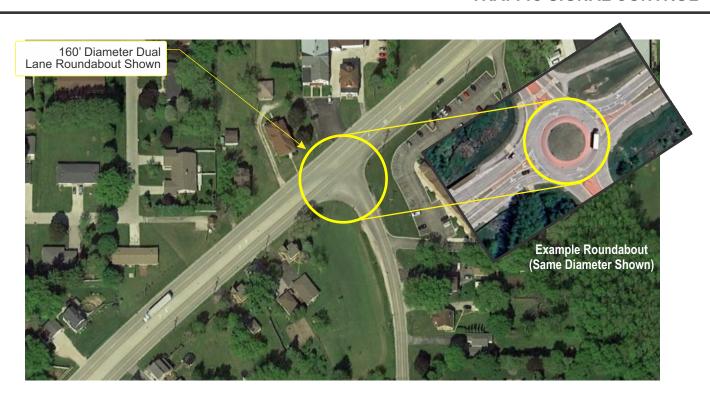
A CONCEPTUAL DRAWINGS 21st STREET/MILL ROAD & EISNER AVENUE
